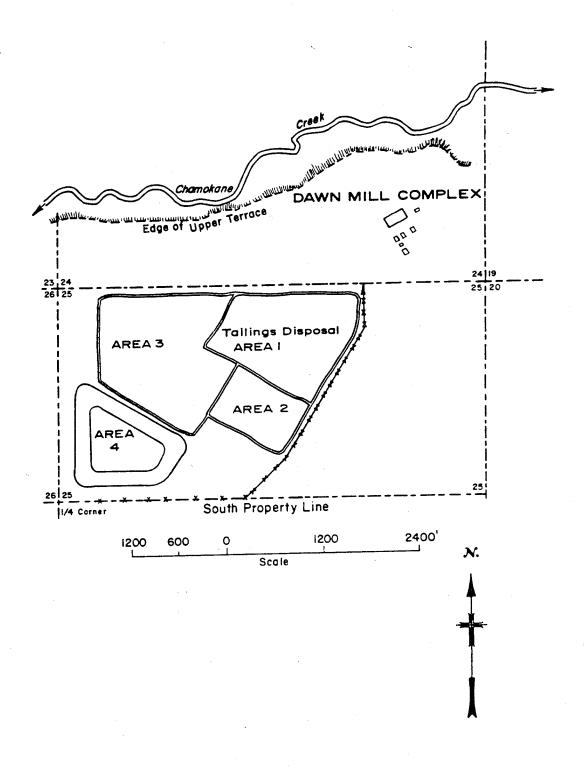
Plan Map of Mill and Tailings Pond Area: Dawn Mining Company, Ford, Washington
